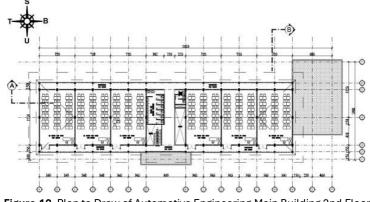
Plan to Draw of Automotive Engineering Main Building 2nd Floor
